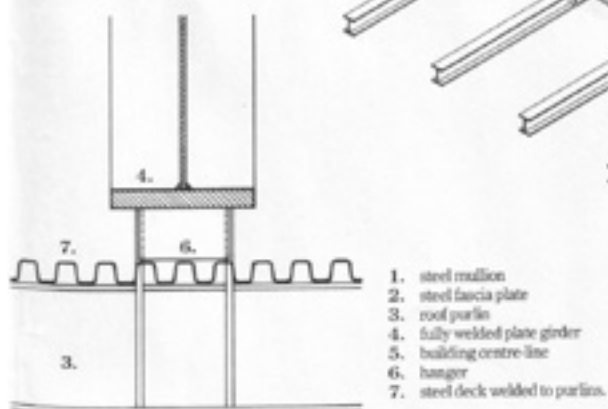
Detail of the connection between the main beam and the suspended purlins.
